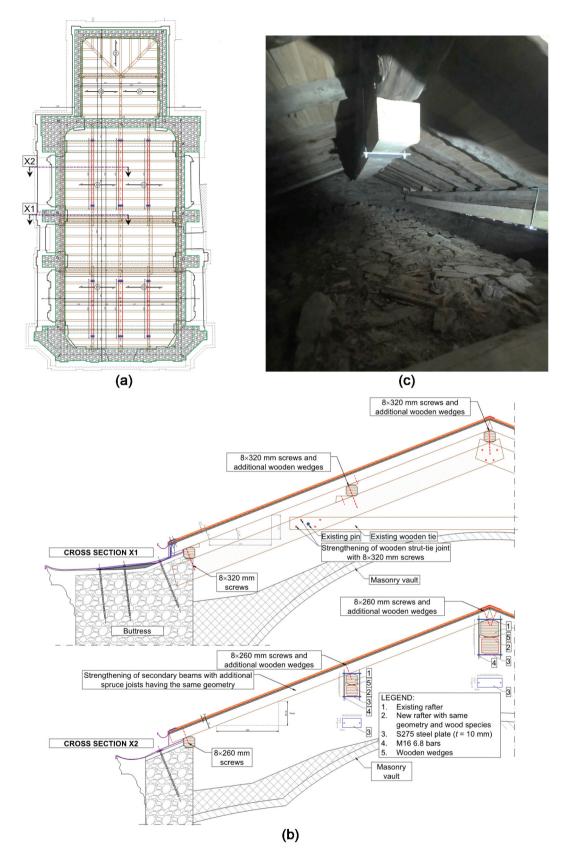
Plan (a) and cross sections (b) of the flexural reinforcement interventions on the roof; (c) realization of the interventions on site.
